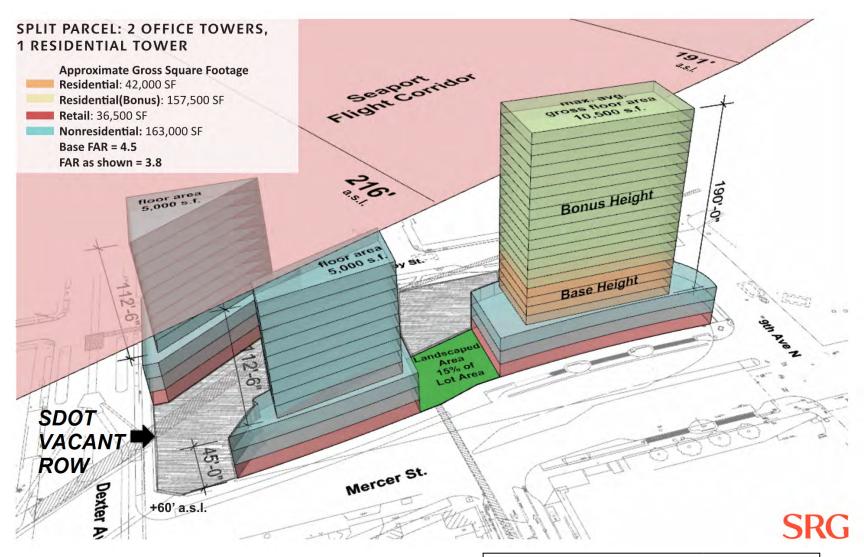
and 2-5 illustrate potential building envelopes without a street vacation.
